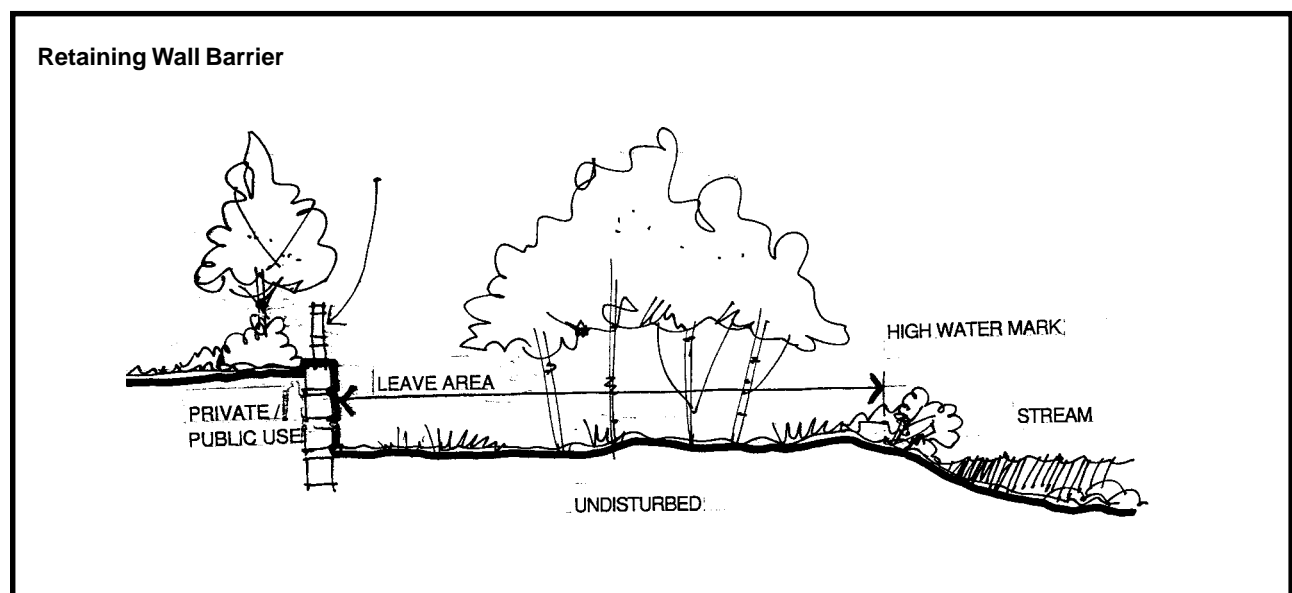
Sketch of Live Barrier in Combination with Fencing and Retaining Walls
